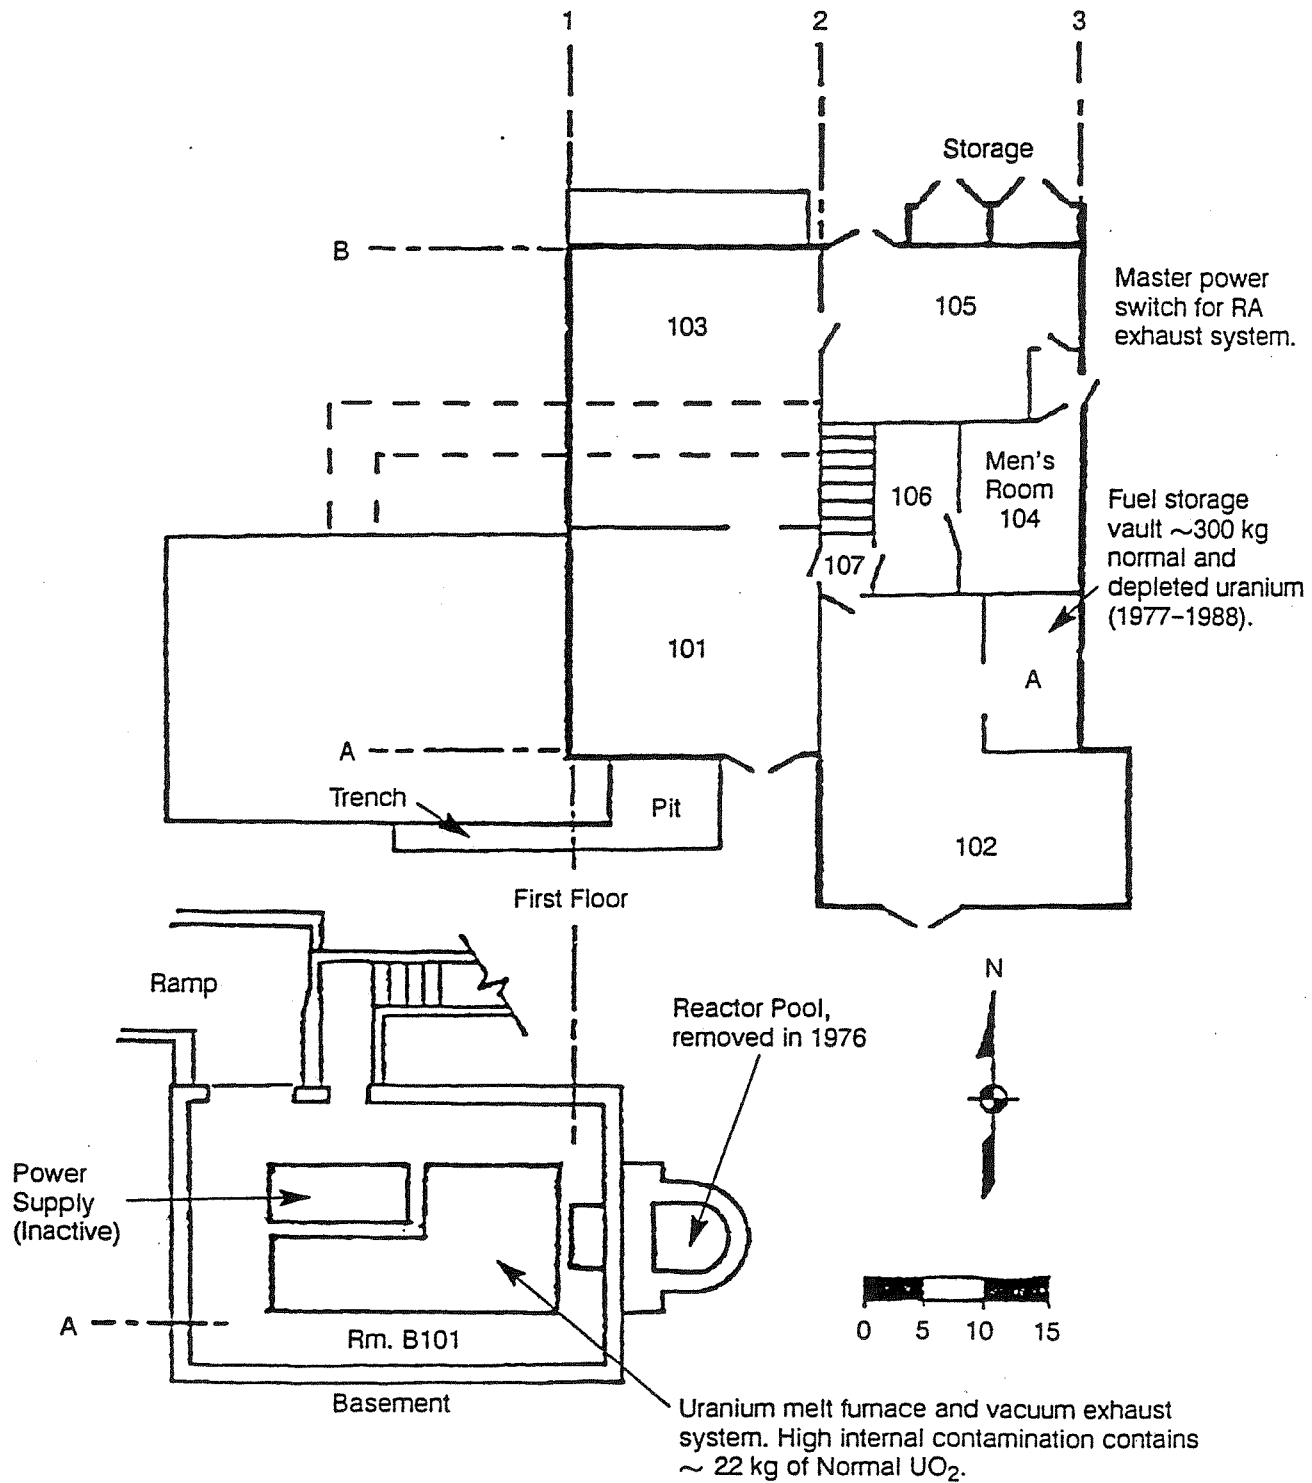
Plan View of Building T028 Prior to Decontamination and Above-Grade Demolition (1977-1988)
